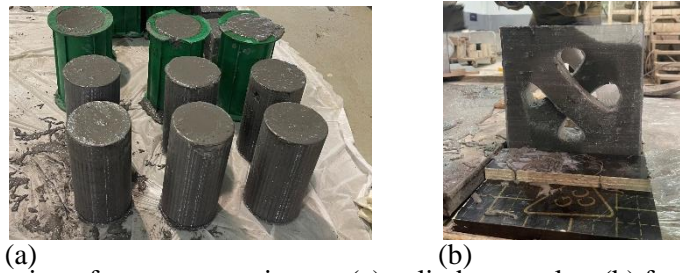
Fabrication of concrete specimens: (a) cylinder samples. (b) façade panel sample.
